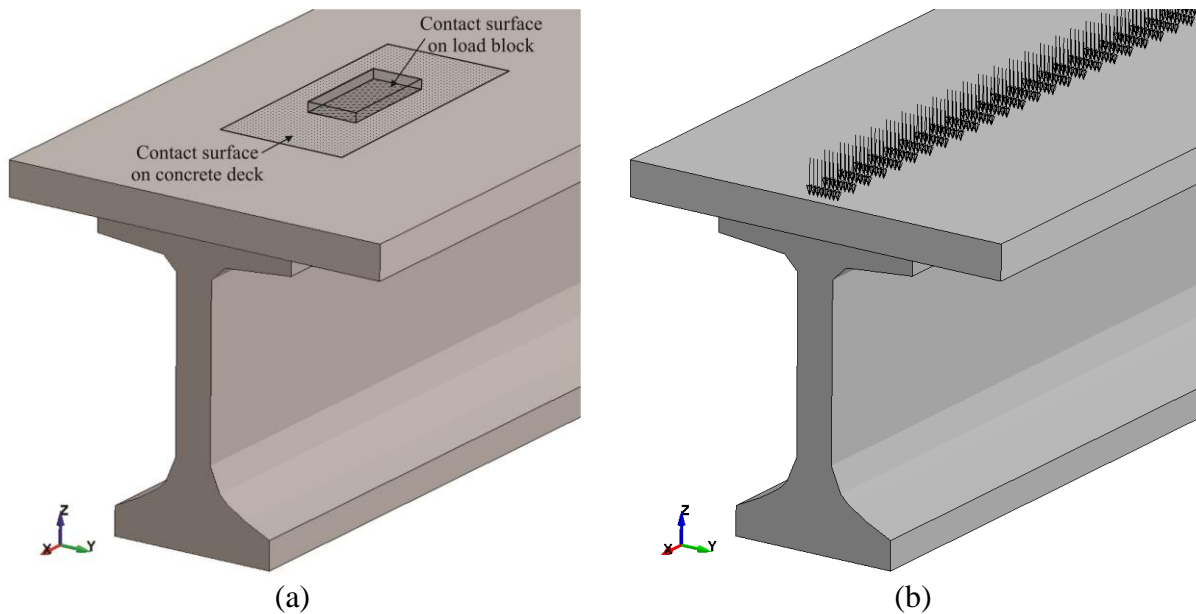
Modeling of external loads: (a) contact surfaces on concrete deck and load block, concentrated load and (b) pressure load on top of concrete deck
